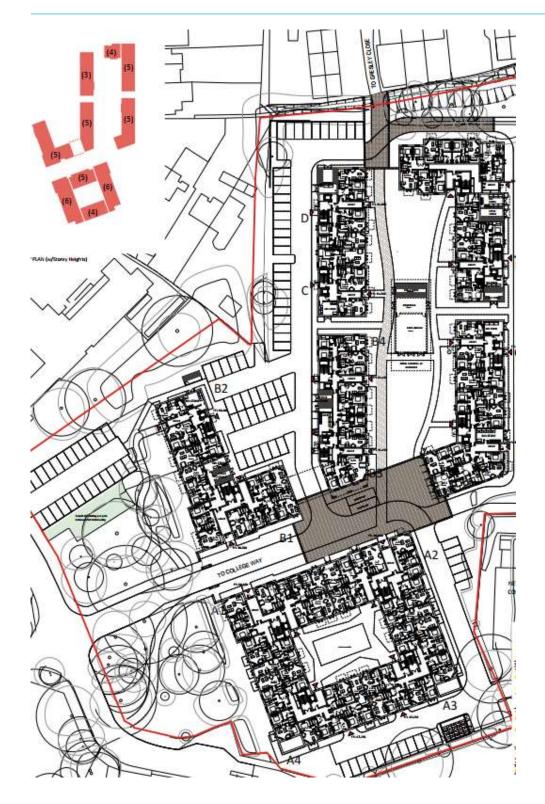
Proposed Site Layout, Saunders Architecture and Urban Design, Drawing number 8375/SK111, Rev P, dated September 2021.
